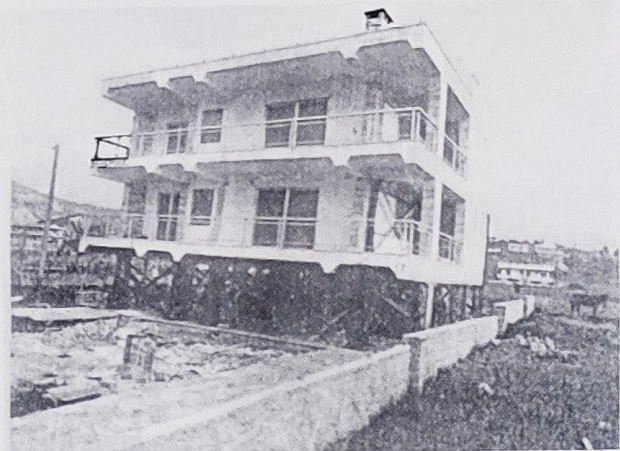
Modern resort apartment building in Alephohori with open first story. The damage was limited to the lower story. The heavy scaffolding (placed after the earthquake) consists of H-shaped steel beams.
